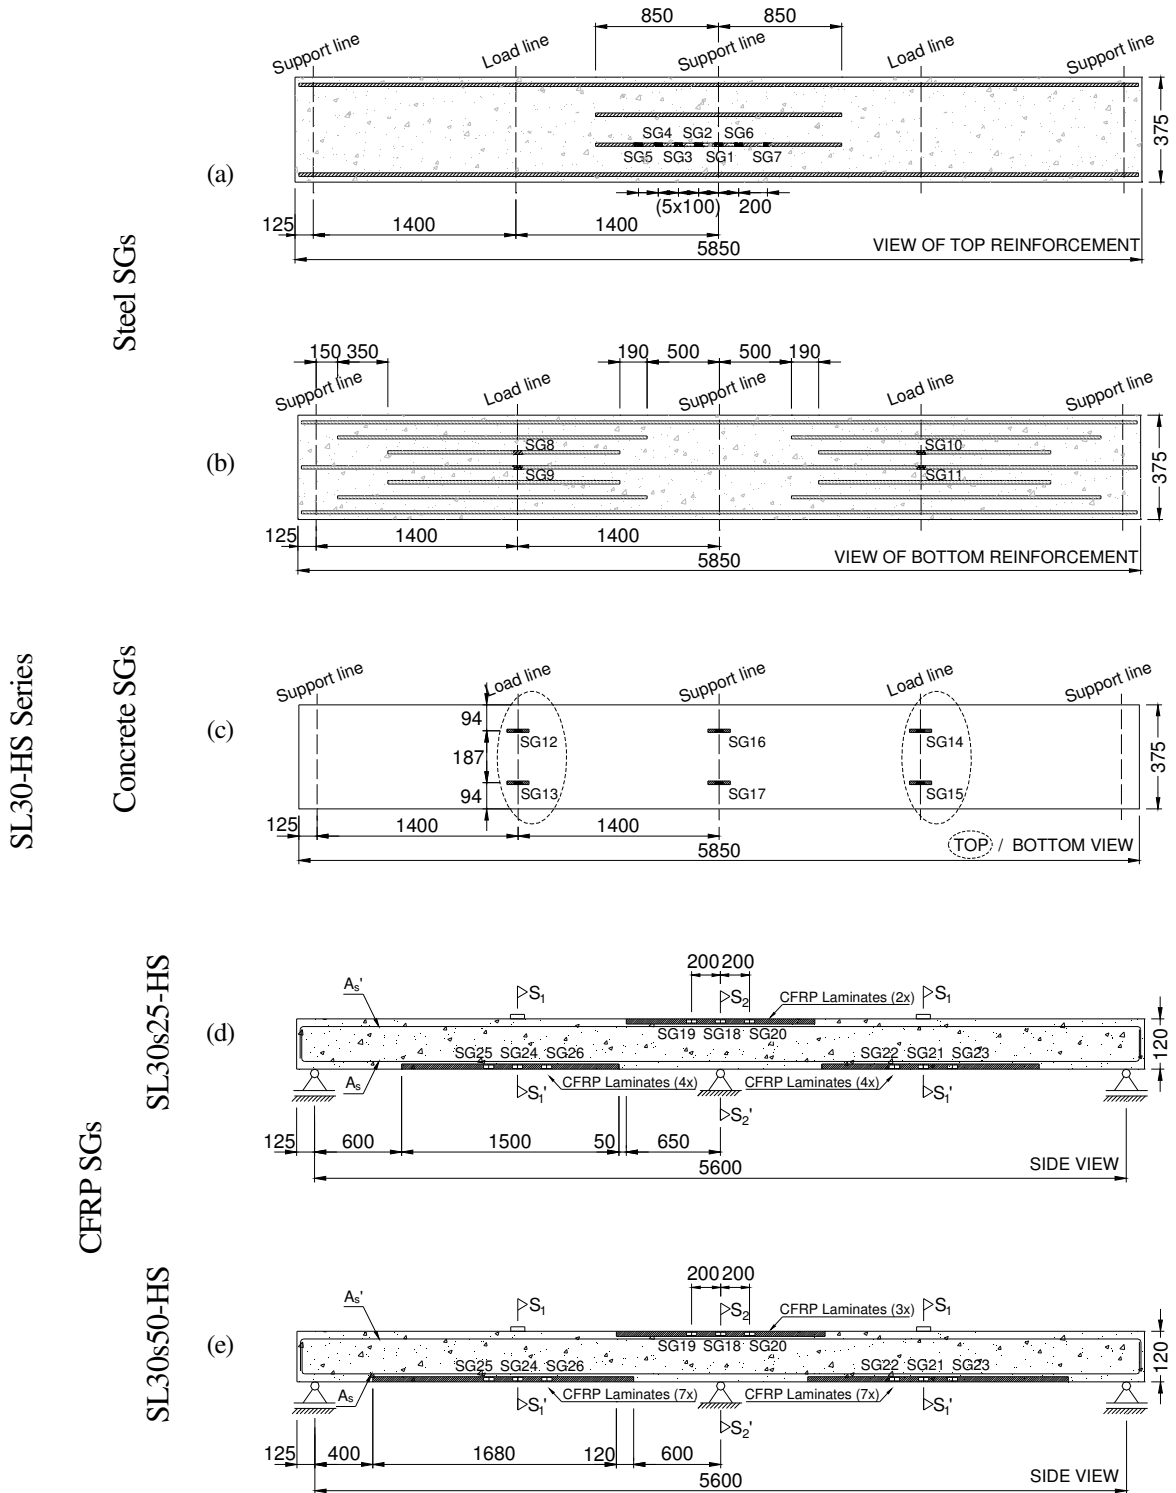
Arrangement of strain gages in: (a) steel bars at hogging region and (b) steel bars at sagging region; (c) concrete slab surfaces; CFRP laminates for (d) SL30s25-HS and (e) SL30s50-HS. Dimensions in mm.
